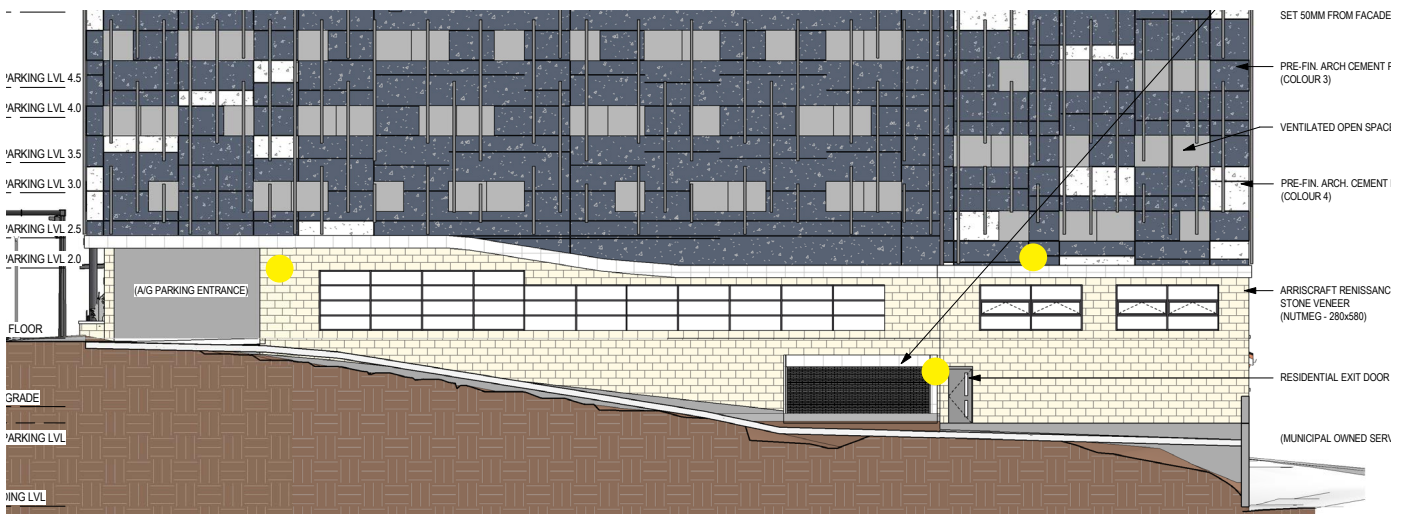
Potential signage locations along the west facade for vehicular access.
